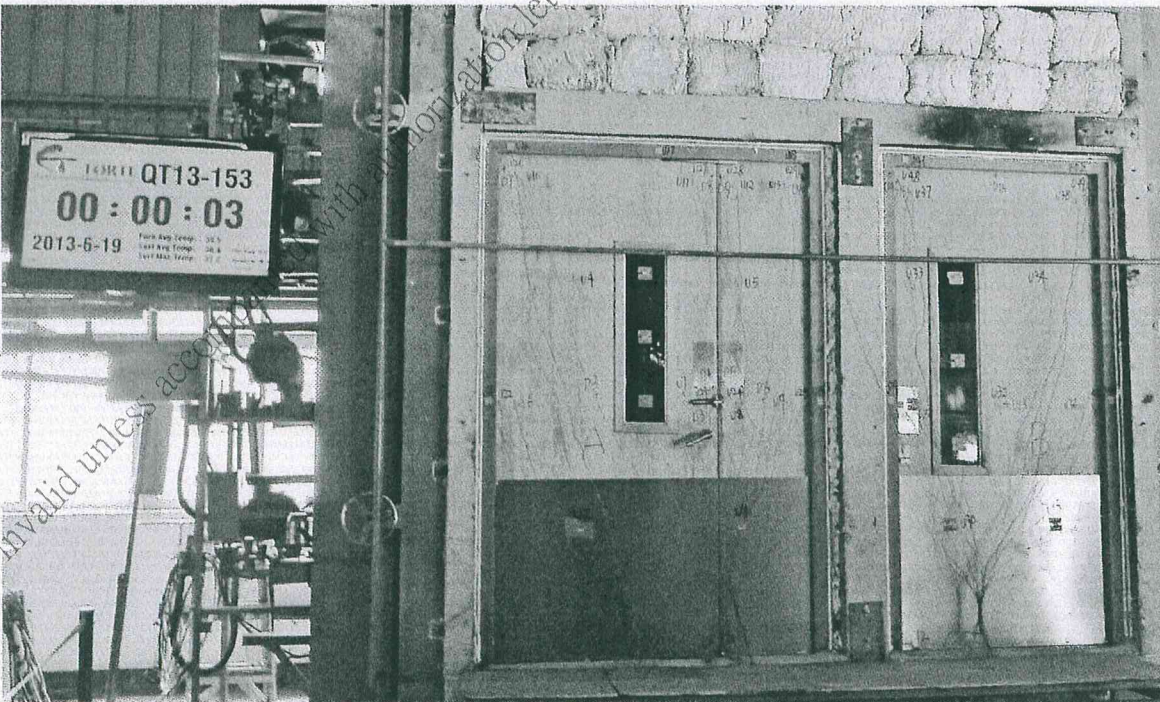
Unexposed surface of the specimen just after the commencement of test. (Left: Door A; Right: Door B)
